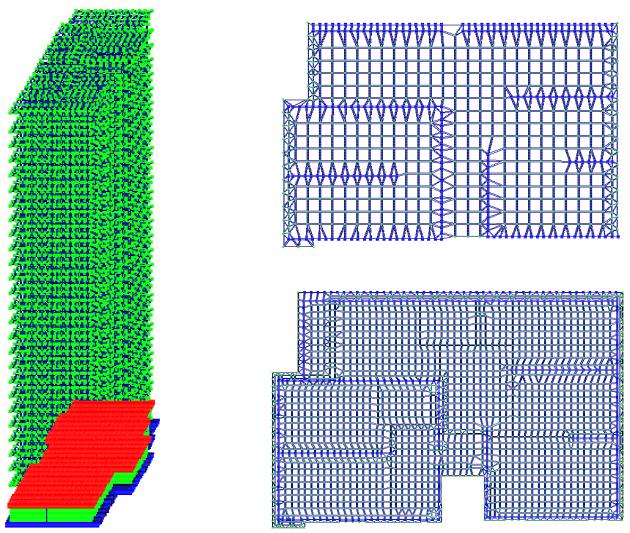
The design model of the building frame, the design model of the slab cut from the building frame, and the design model of the slab compiled separately (the location of the calculated floor slab is highlighted in red).
